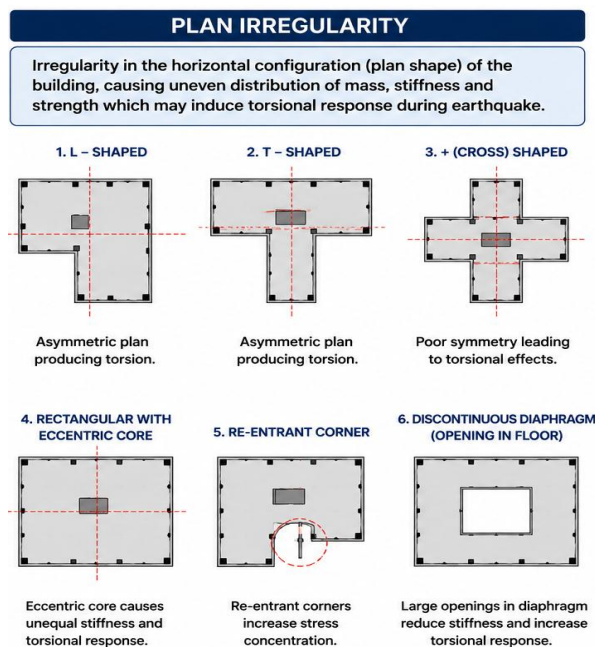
Typical Forms of Plan Irregularity in Multi-Storeyed Buildings
